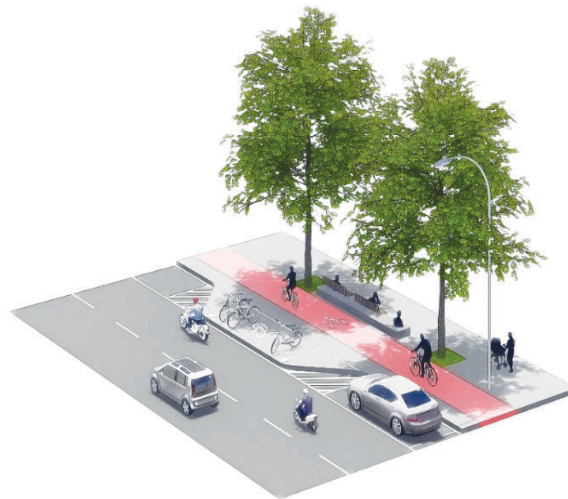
Bicycle lane is protected by elevating it to the sidewalk level
